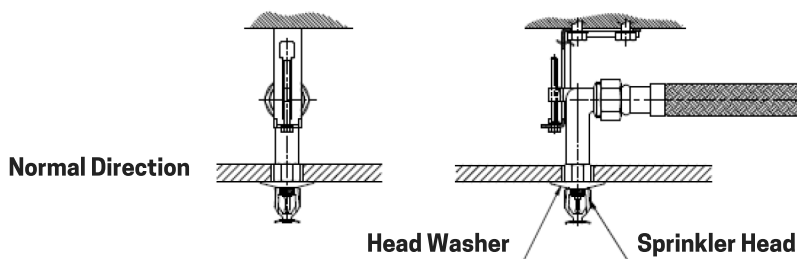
Fesco© Flexible Sprinkler Hose complete with Adjustable Bracket - Example of Installation
